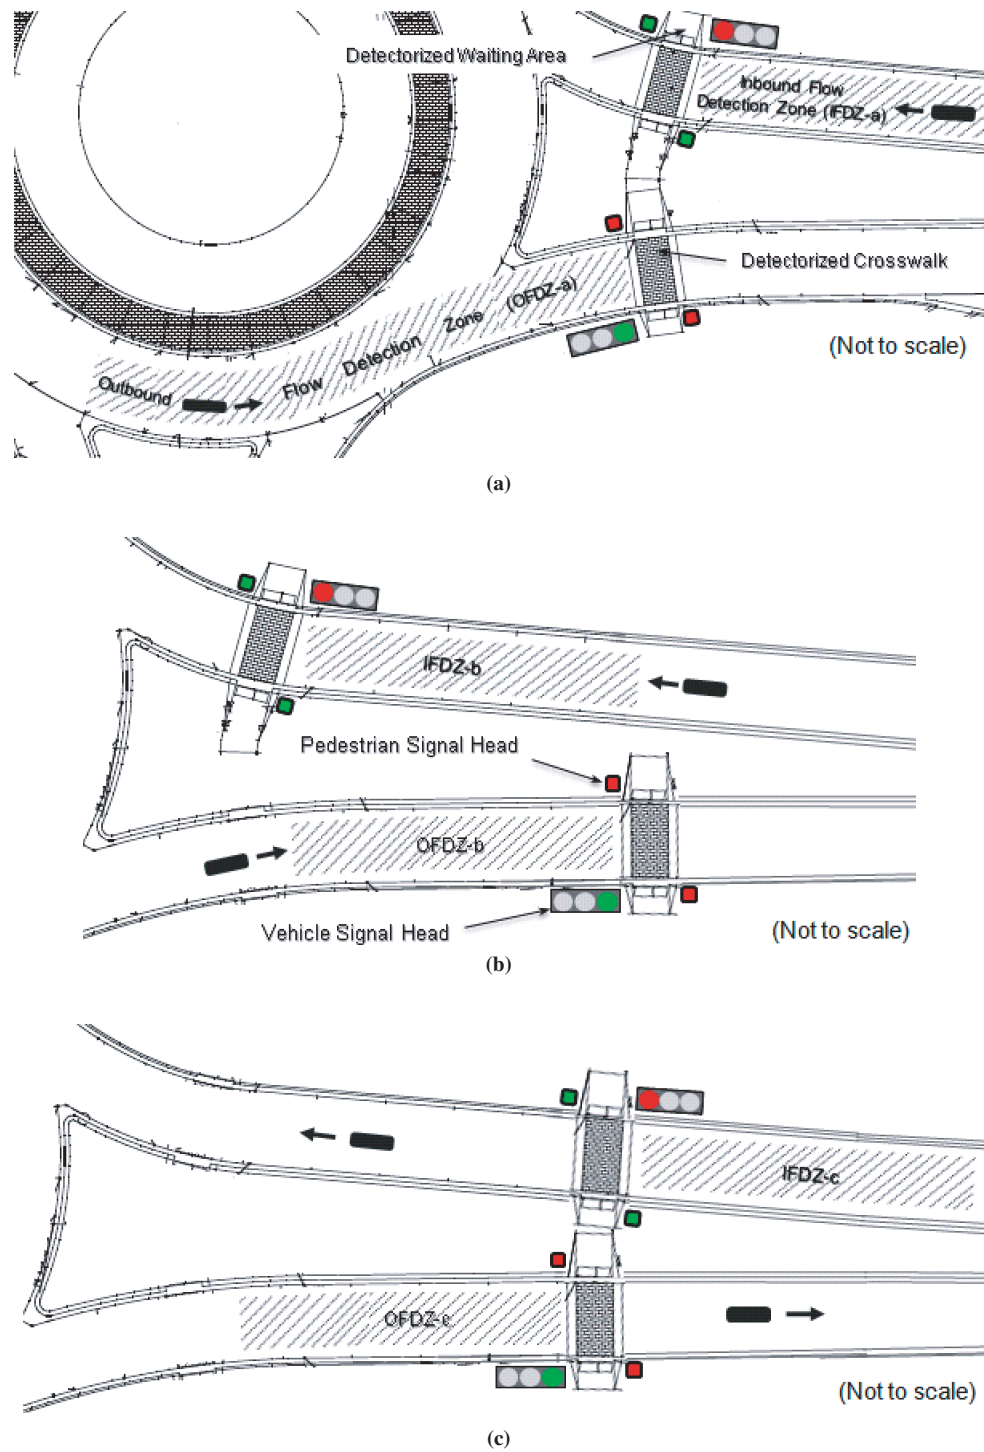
Crosswalk layouts and detection zones for input data collection: (a) conventional layout, (b) offset layout, and (c) distant layout.
